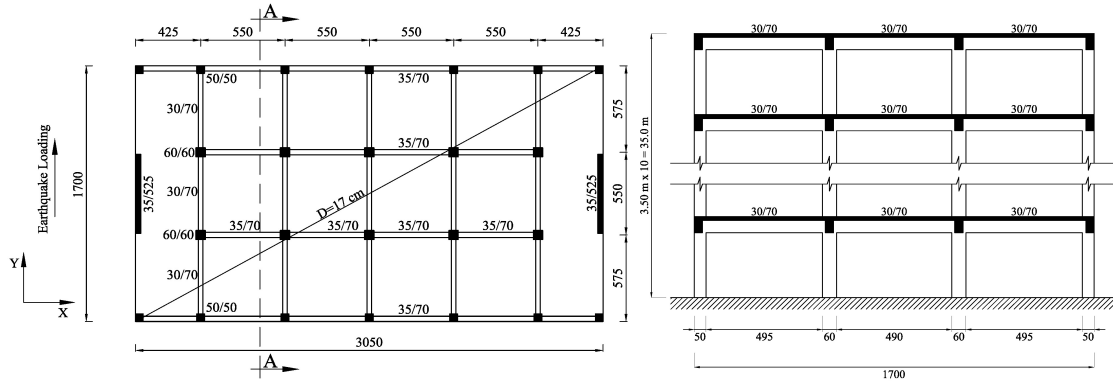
Plan and section A-A of the studied 10-storey RC building ( $\eta = 0.8$ )
